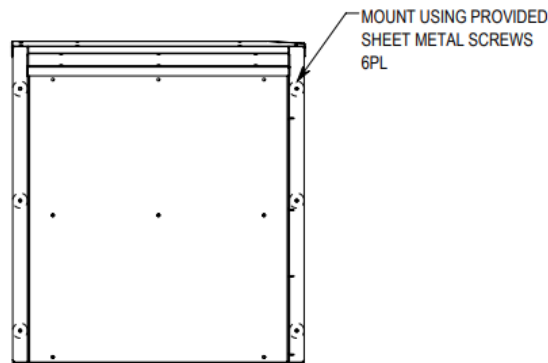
PLENUM MOUNTING LOCATIONS
